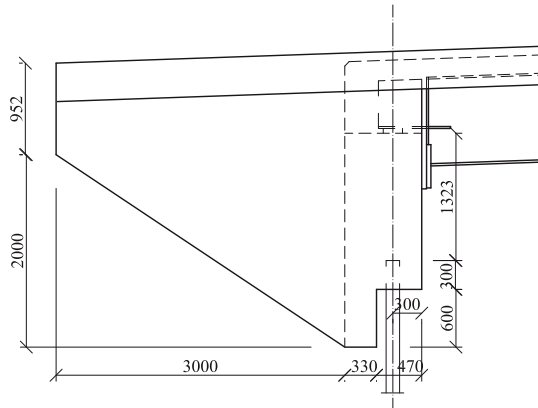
Abutment of the bridge over the Leduån (dimensions in mm and levels in m)
